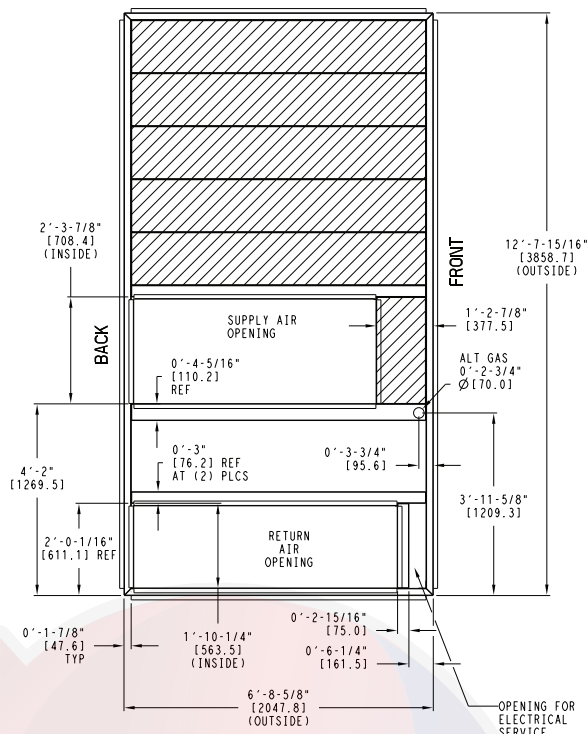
Roof Curb Details – 17 and 20 Size Units
